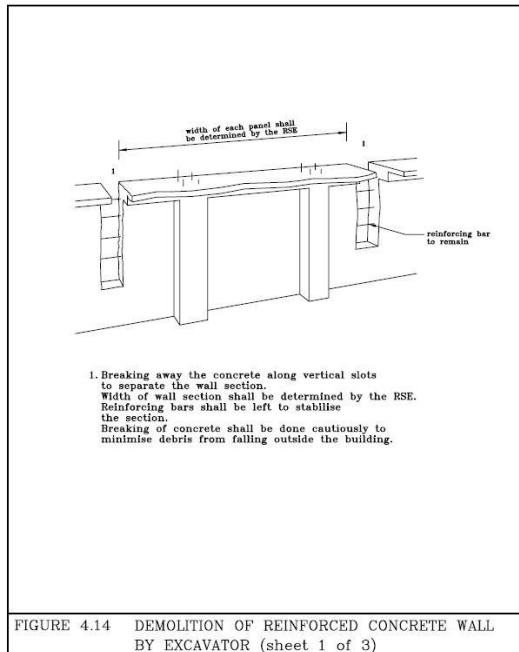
DEMOLITION OF REINFORCED CONCRETE WALL BY EXCAVATOR (sheet 1 of 3)
